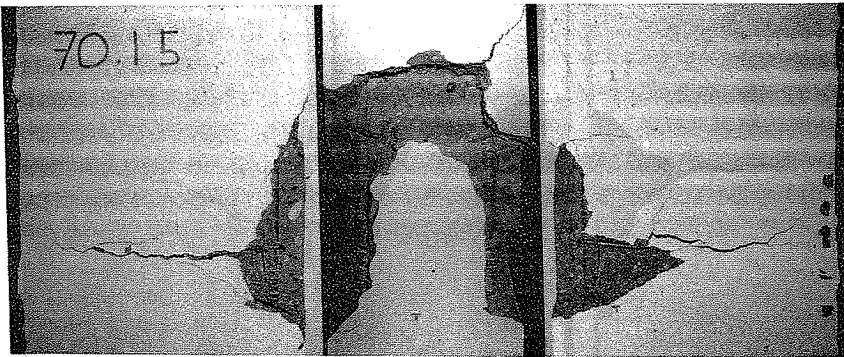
Failure of S.B.-specimen No. 70/15.
